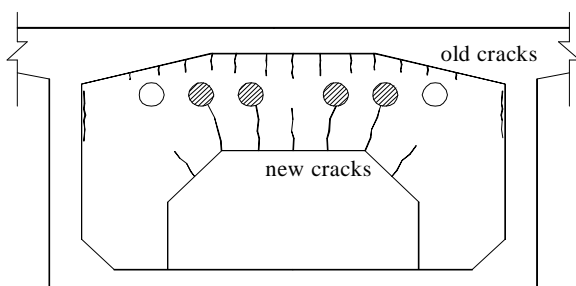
(b) Drawing view of anchor beam cracks
